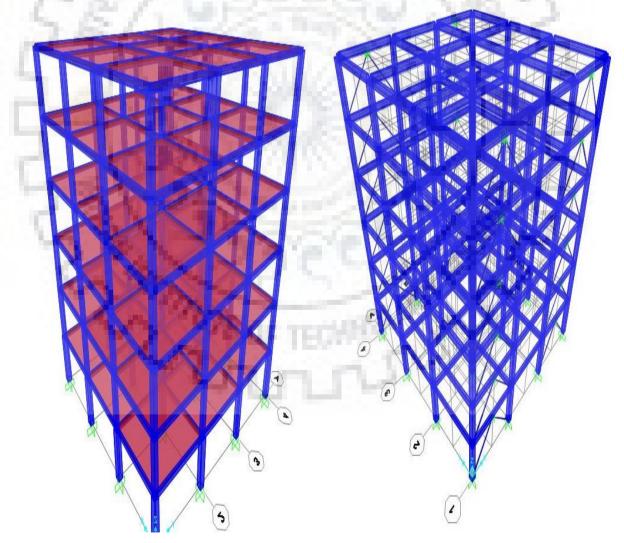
3D Modelling of Building without Dampers and with Dampers
